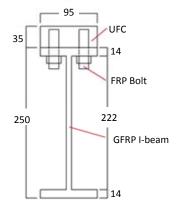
Cross-section of GFRP and UFC composite beam (unit: mm)
